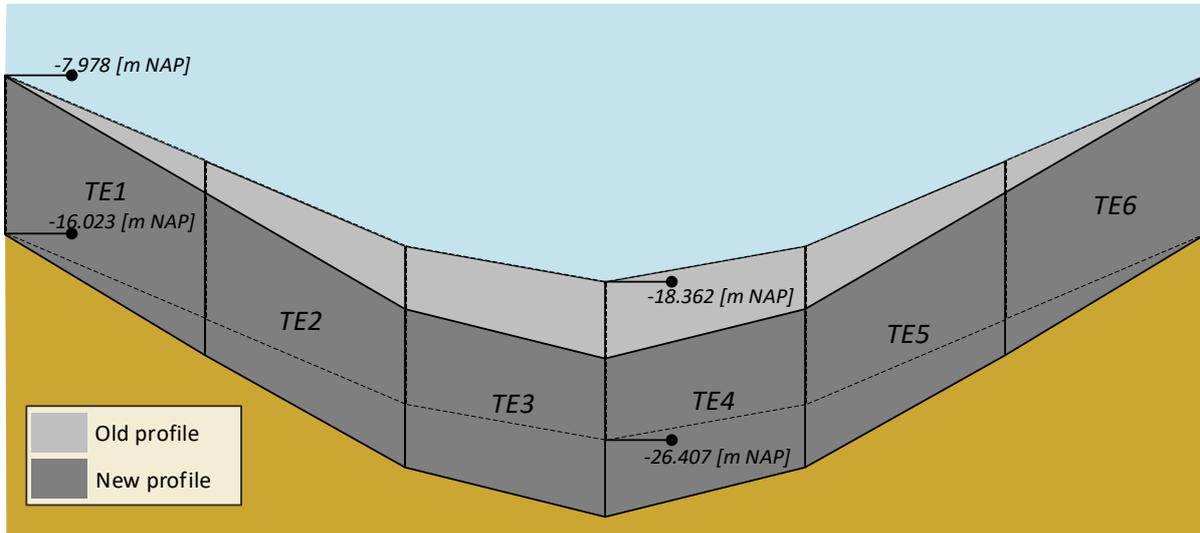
, NEW TUNNEL ALIGNMENT; LONGITUDINAL VIEW
